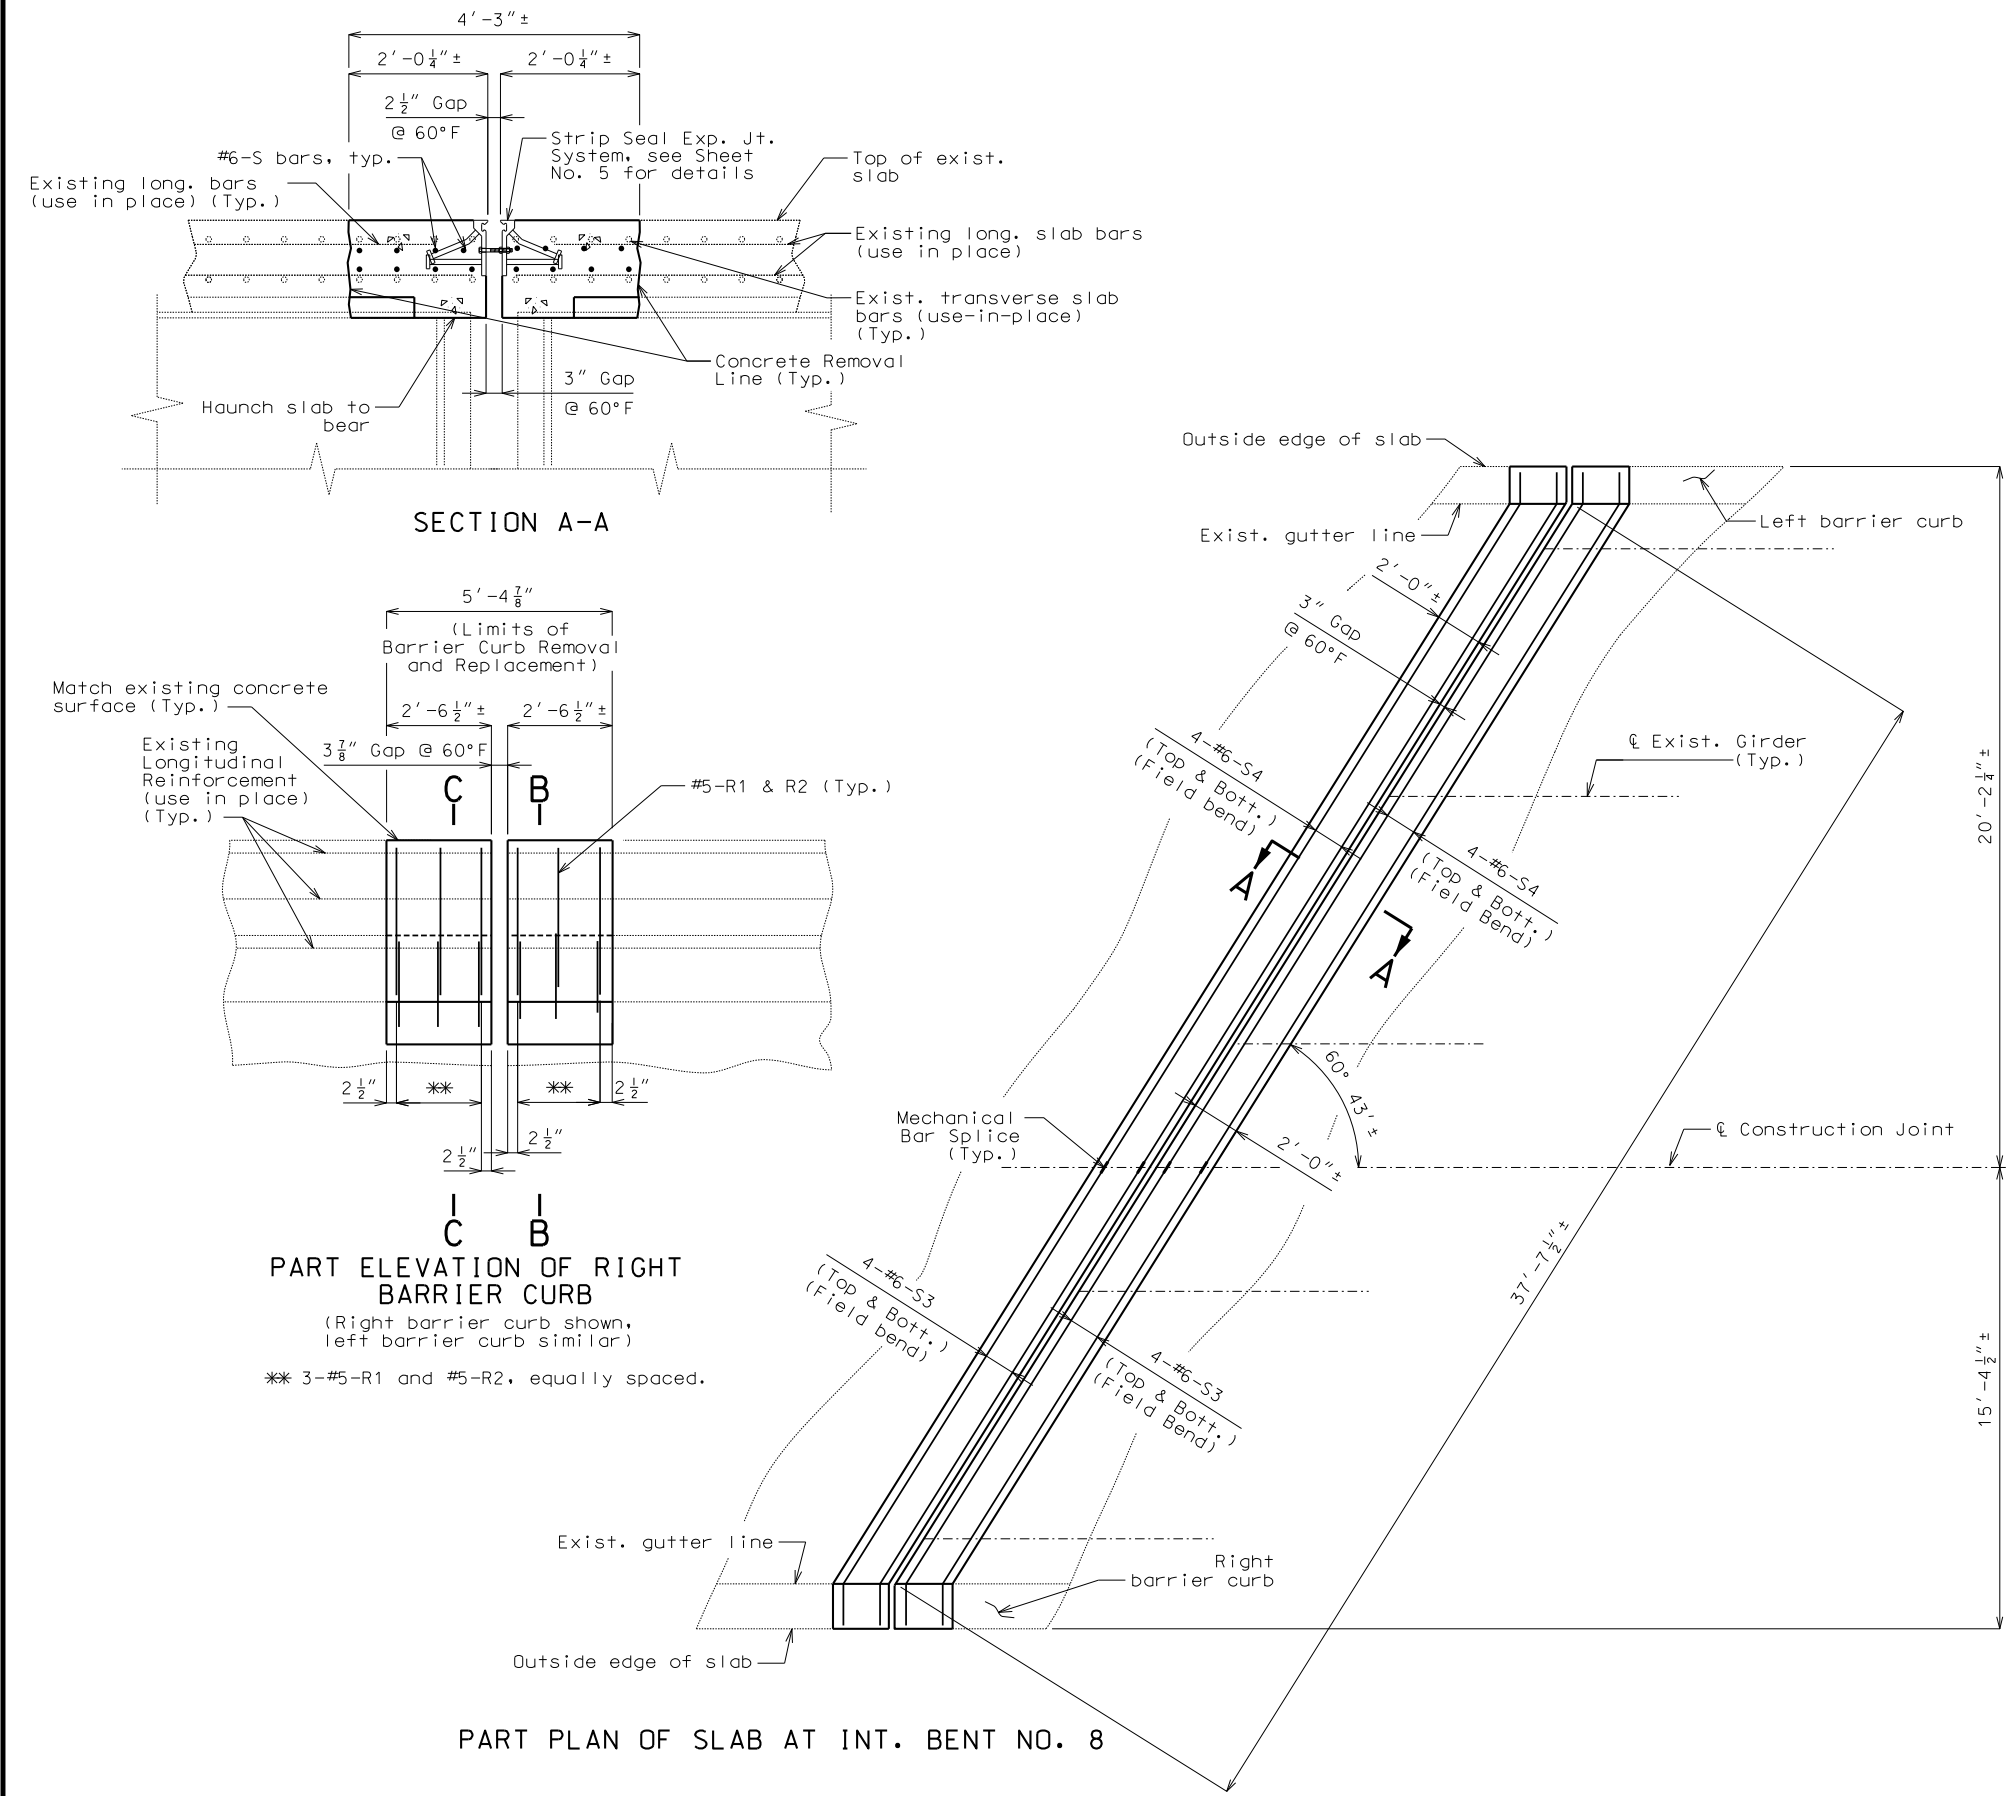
DETAILS OF SLAB AND BARRIER CURB AT JOINT 2 NEAR INT. BENT NO. 5
